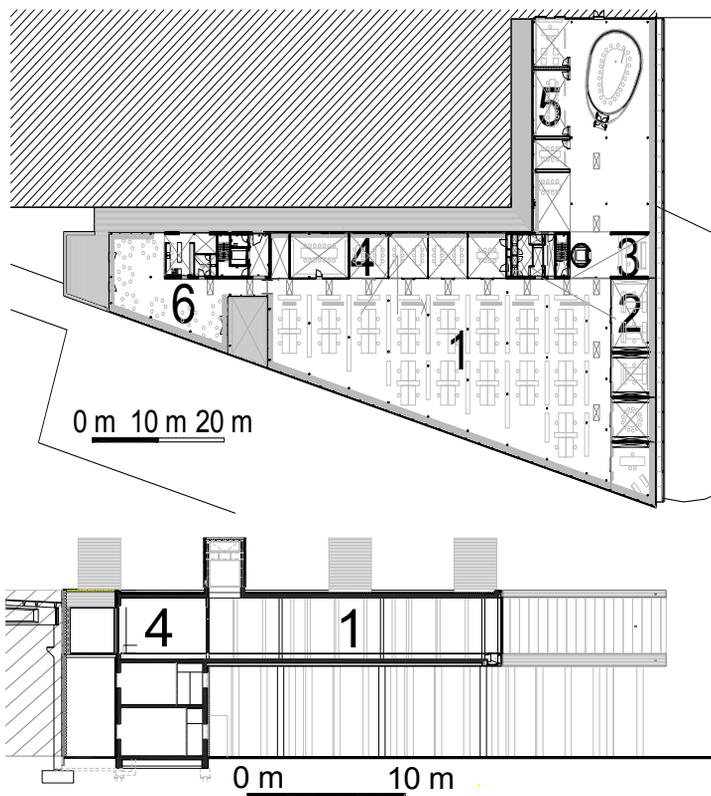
FLOOR PLAN (TOP) AND VERTICAL SECTION OF THE OFFICE FLOOR (BOTTOM)
